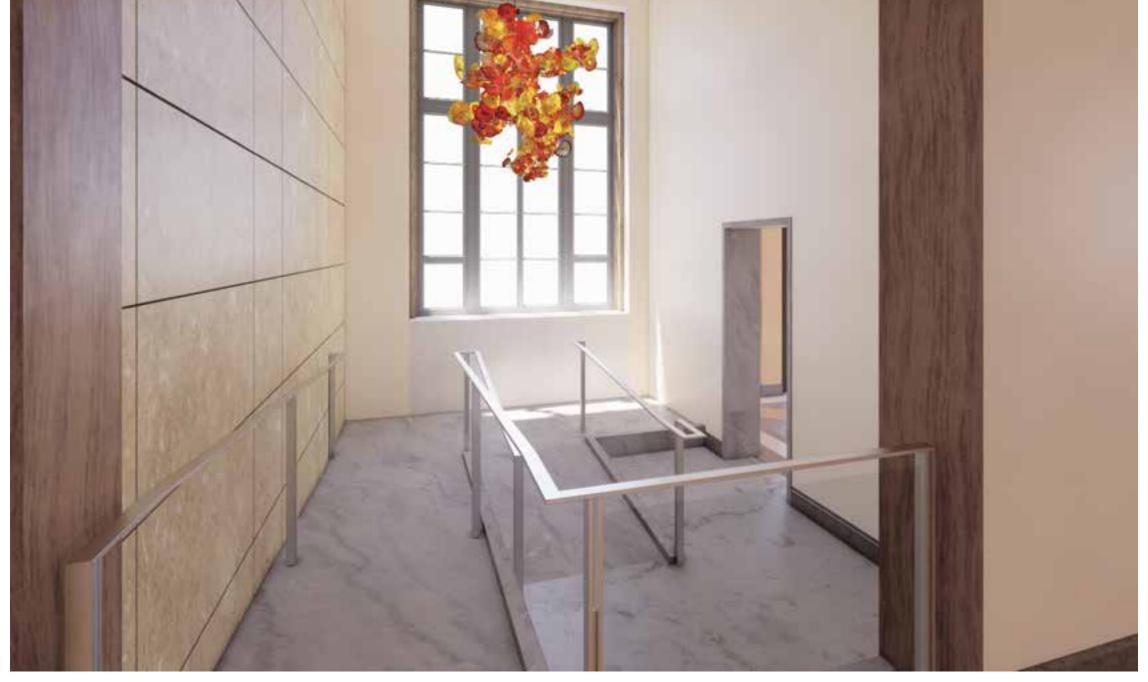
Perspective View of FRB-East Building Accessible Lobby Ramp
